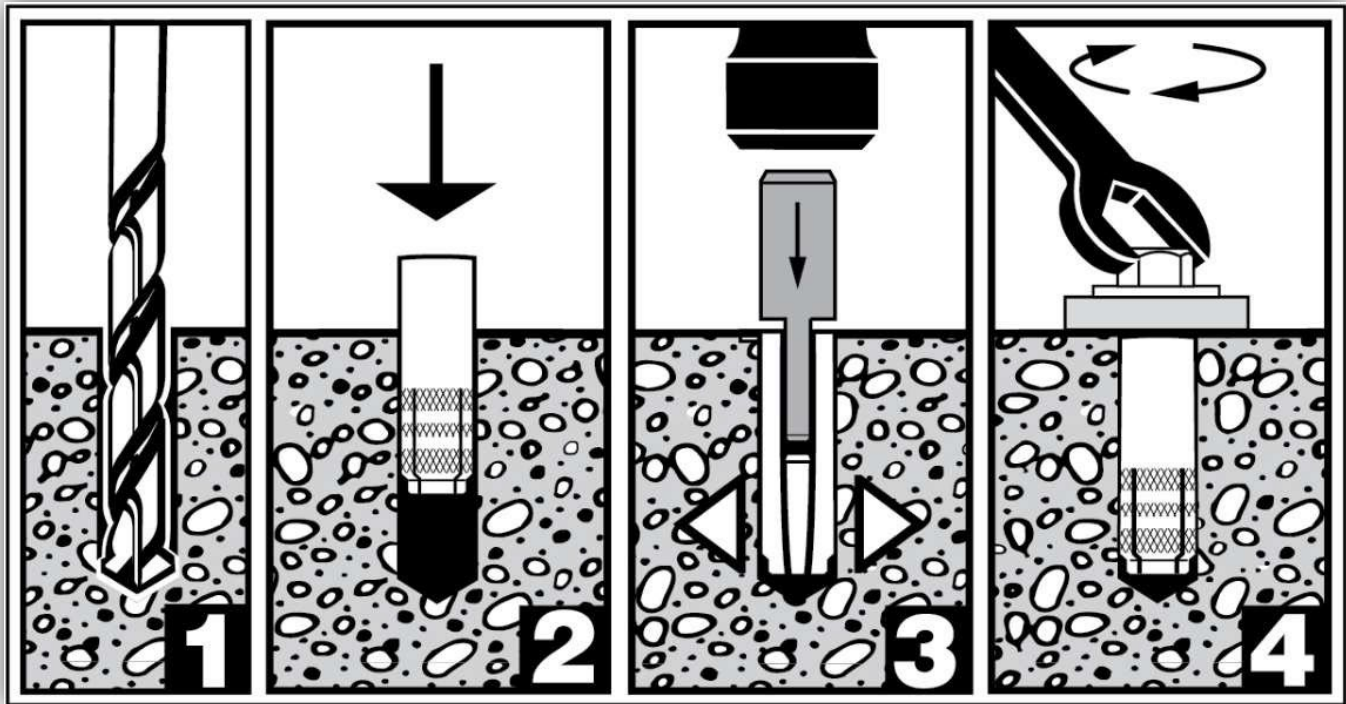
Illustration of the use of a drop-in style concrete anchor system (<https://cobraanchors.com/en/drop-in-stainless-steel-11789.html>).
